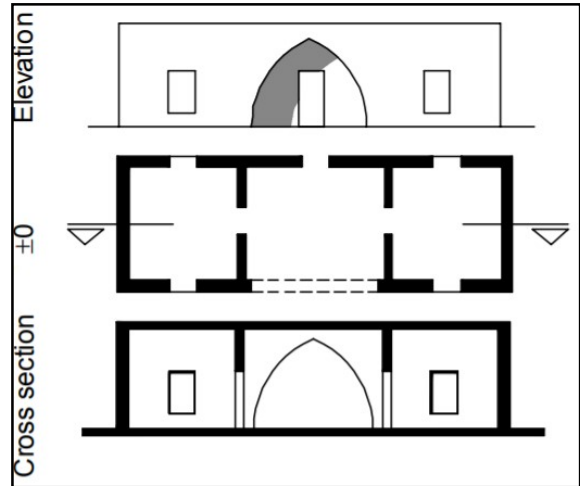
(a) Standard Plan, (b) Cross-Section and (c) Elevation of Liwan as Tripartite Structure. Source: (Corpus and Euromed, 2003) Accessed 10-1-2021
